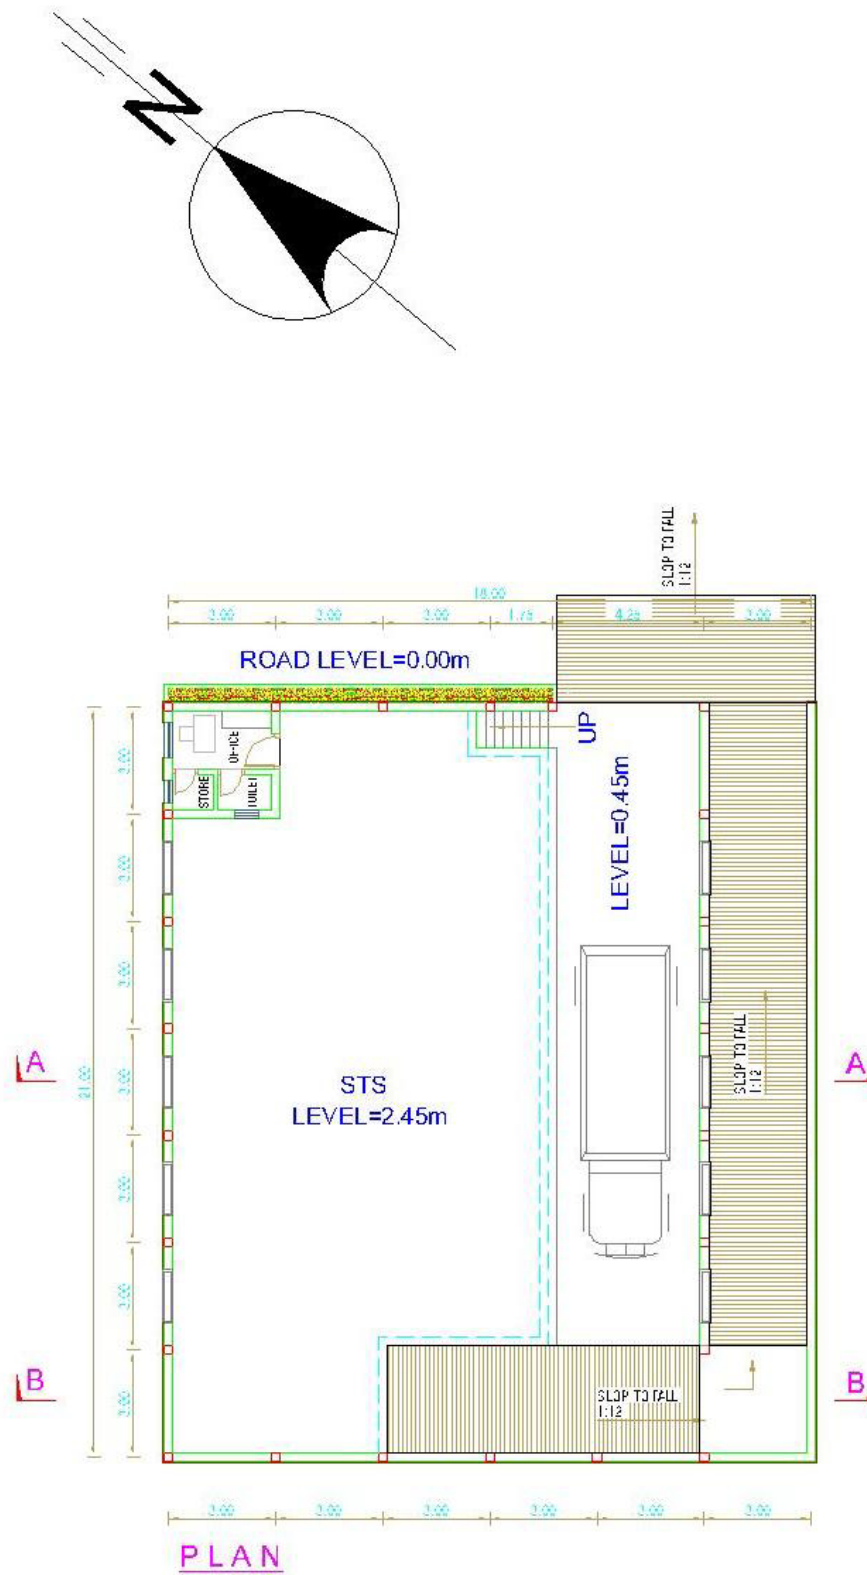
STS – 5 Berry Bandh Mohammadpur Preliminary Plan
